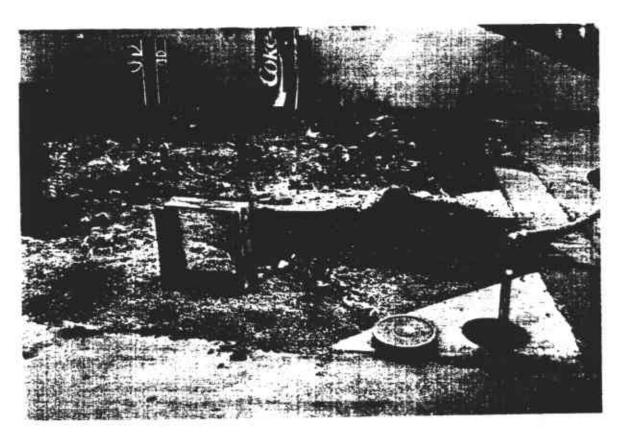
UST backfill material after removal of concrete slab. Pumping water from observation well in tank backfill.
